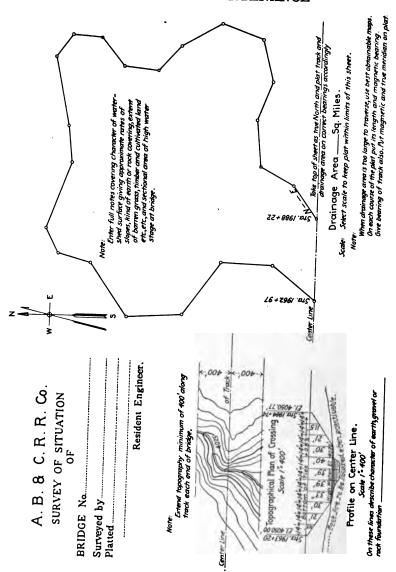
Field Observations Necessary for Determining Size of Waterways. (Am. Ry. Eng. Assn.)
